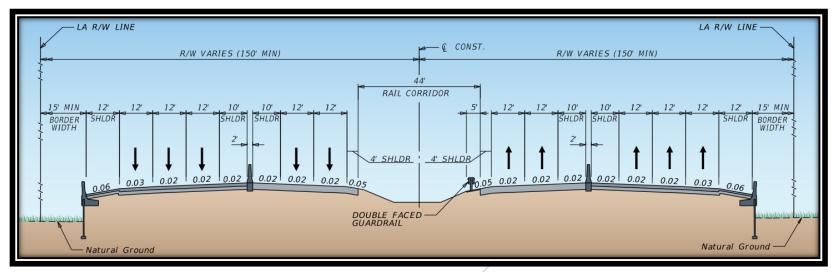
Proposed Typical Section (6+4 with rail envelope) – E. of Central Florida Parkway to SR 528
